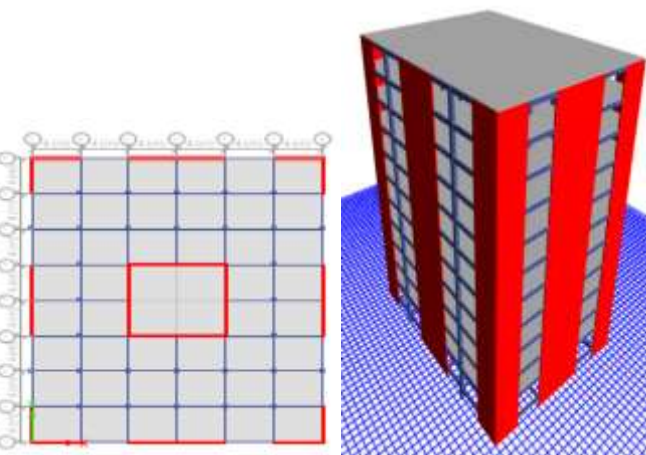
Plan elevation & 3D view for 0% opening with shear wall at center & periphery of the openings.
